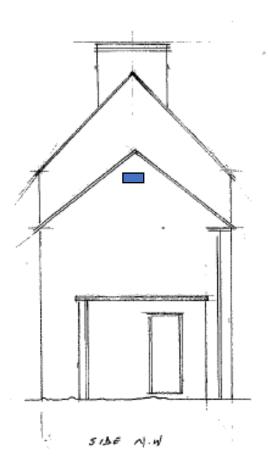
Plan showing the location of the Vivara Pro WoodStone House Sparrow Nest Box (indicated by the blue rectangle).
